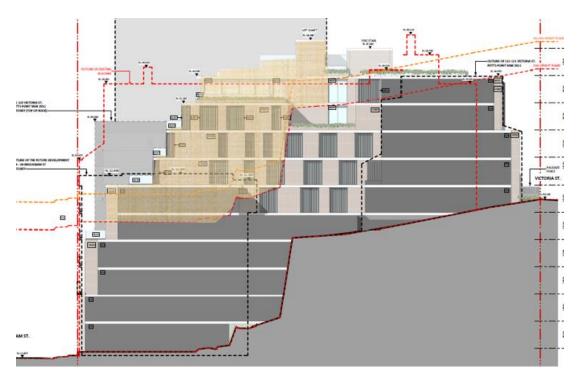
Excerpt of proposed southern elevation which shows building form which does not relate to the topography of the site (highlighted in yellow)
